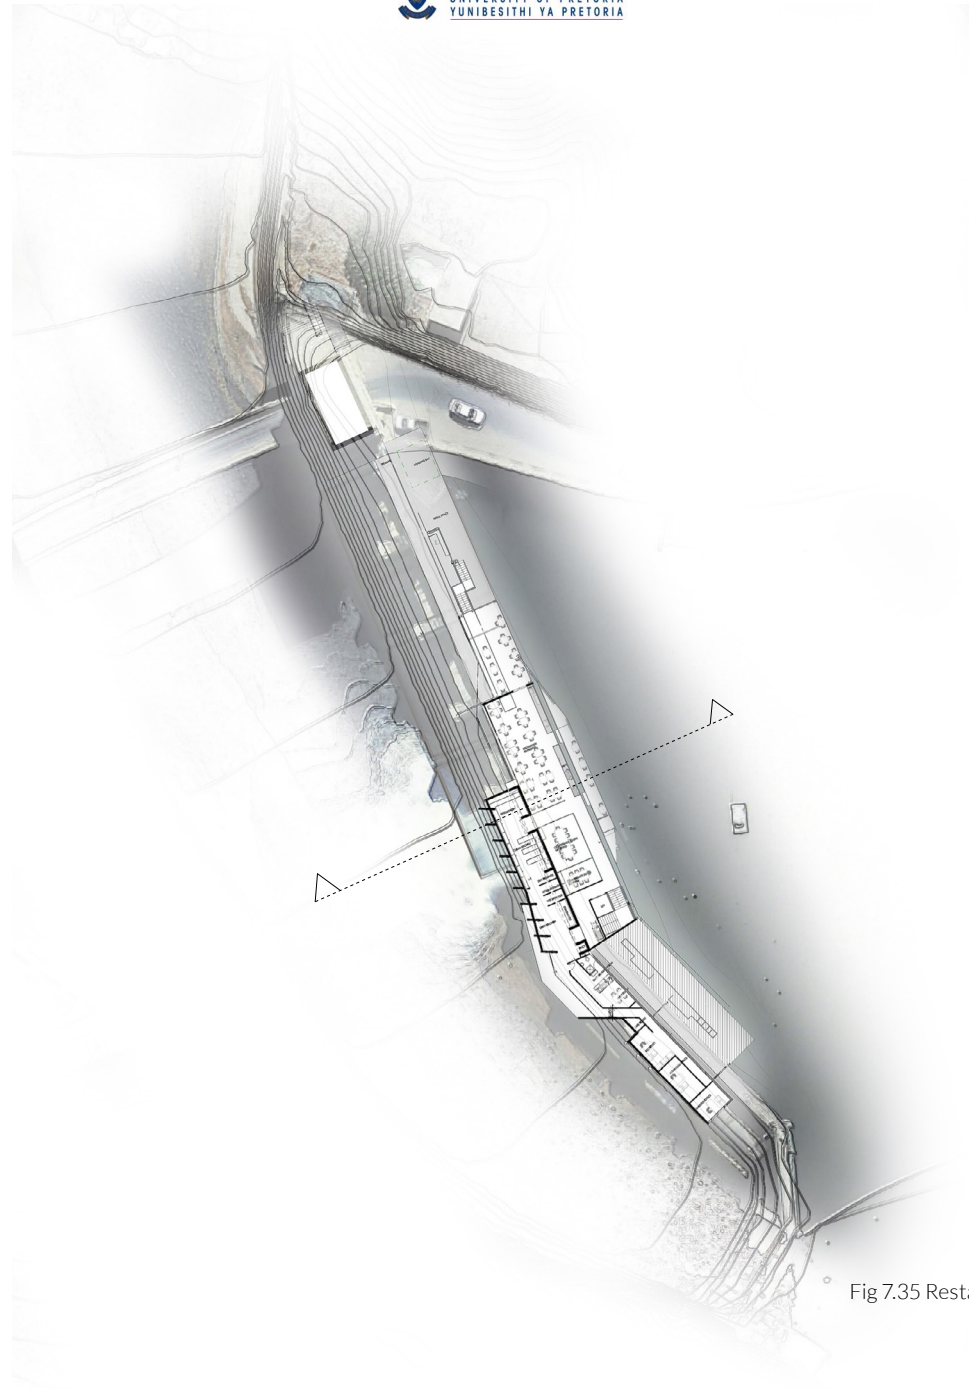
Restaurant Building Plan (Author, June 2016).
